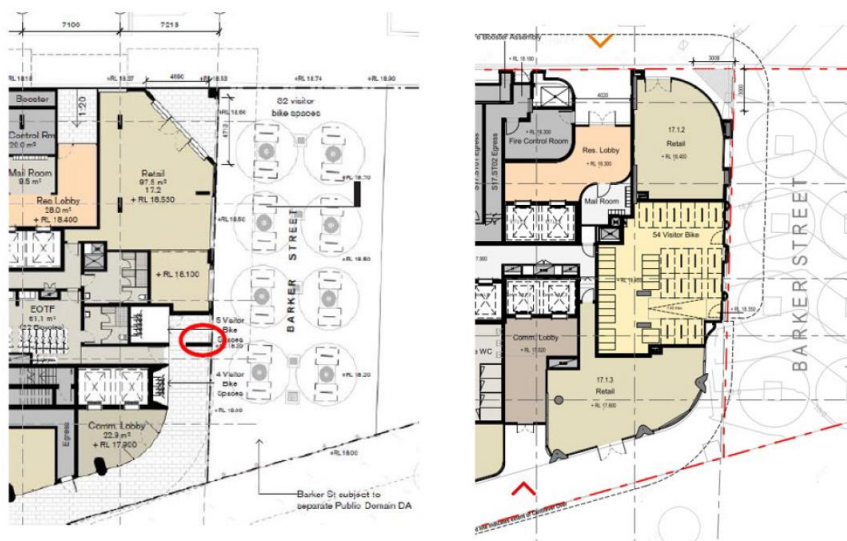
Site 7 Level 6 podium, with the approved floor plan on the left and the proposed plan on the right
